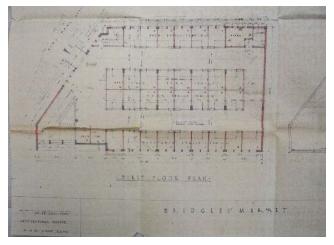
Plan of First Floor of Bridges Street Market drawn up by Government Architect
